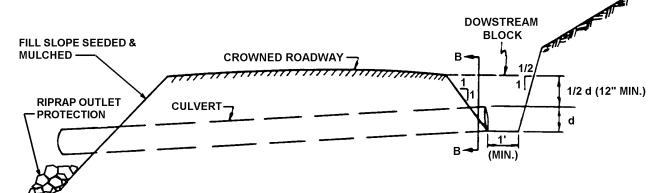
Cross-section of Insloping Roadway at Culvert
